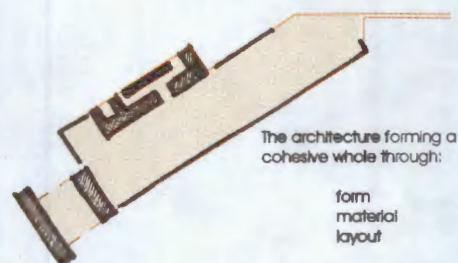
Groot Constantia: Site plan (sketch by author, 2010)
